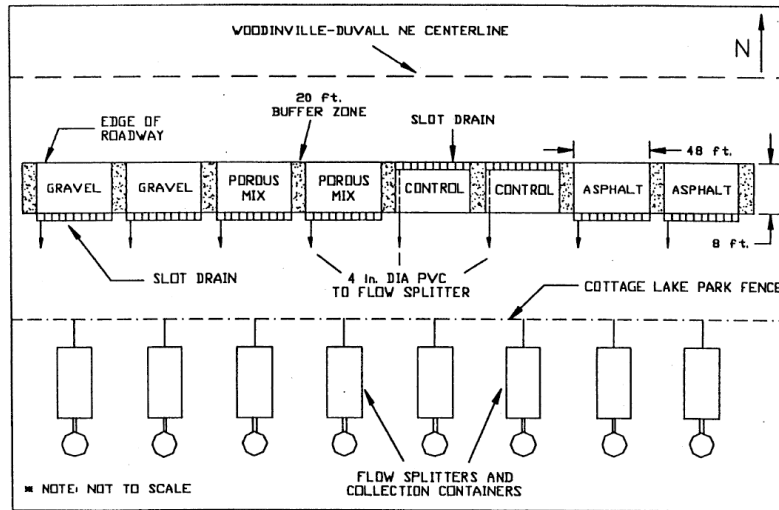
Plan View of Road Shoulder Test Sections and Stormwater Runoff Collection System (22)
